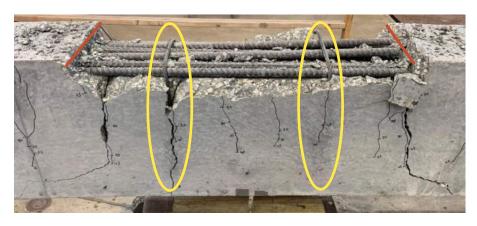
Shear Span – Early Testing (C3/60-40-5-200)
